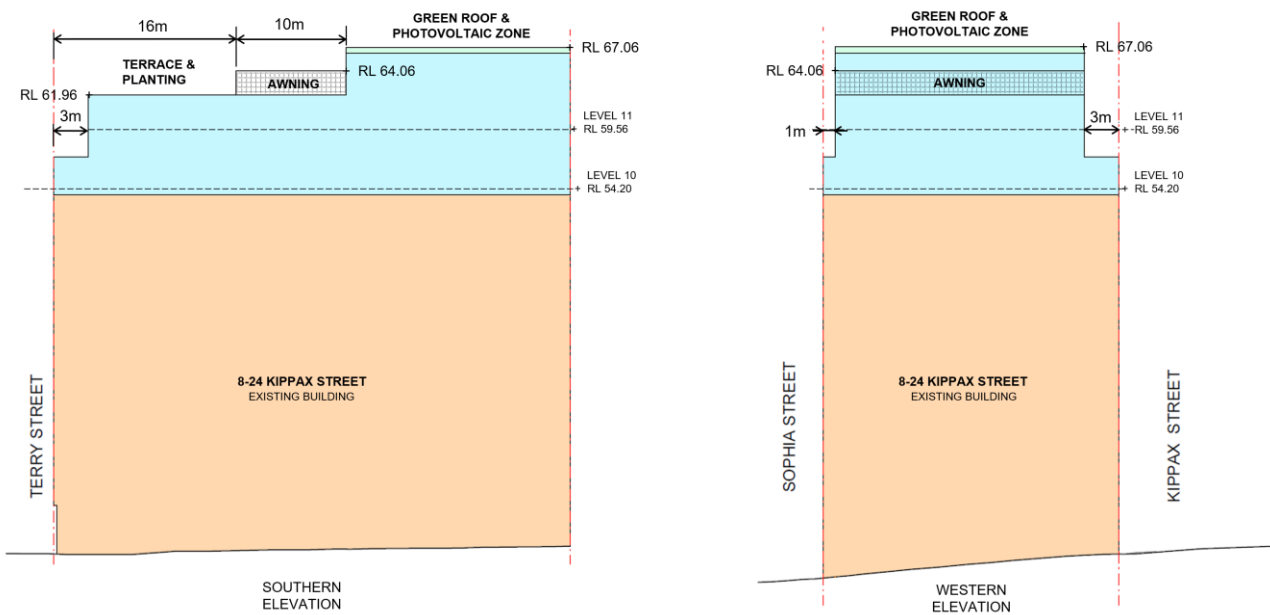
xx 8-24 Kippax Street, Surry Hills – envelope elevations
